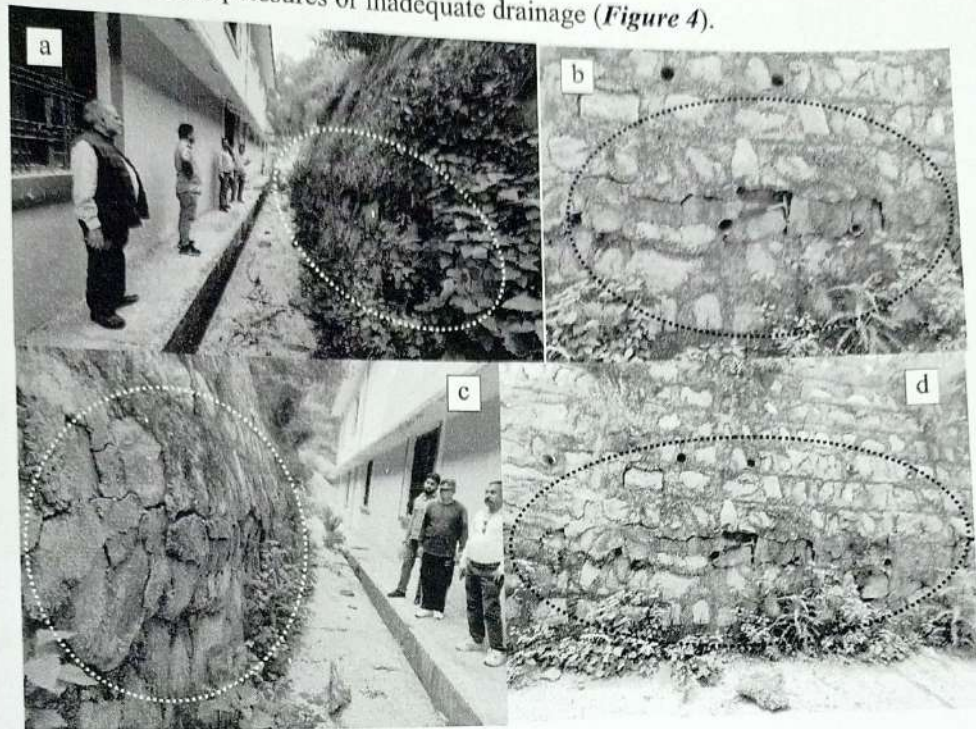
Field photograph showing damage to a retaining wall caused by seasonal drainage and inadequate water management.
